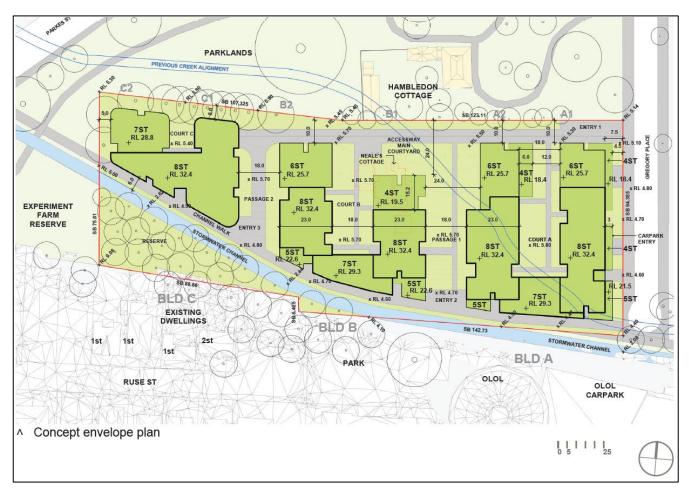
Concept Envelope Plan (source: Stanisic Architects Design Report)
